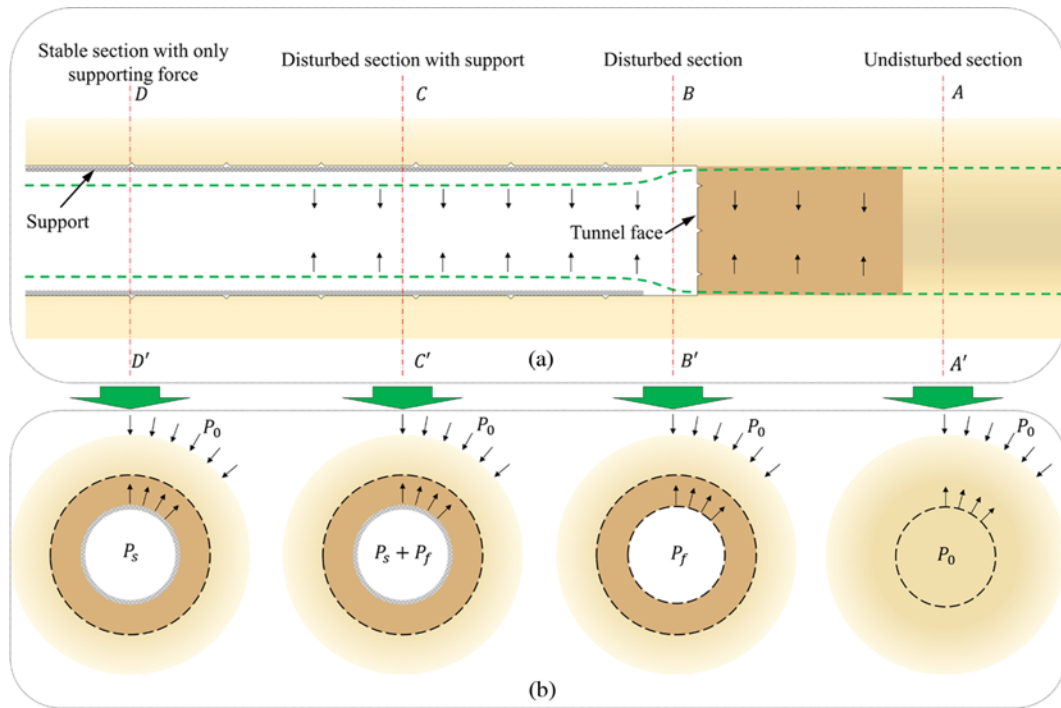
The Complete process of Interaction between Surrounding Rock and Support: (a) Tunnel Longitudinal Section, (b) The relationship between Surrounding Rock and Supporting Force on Different Cross-Sections of Tunnel
